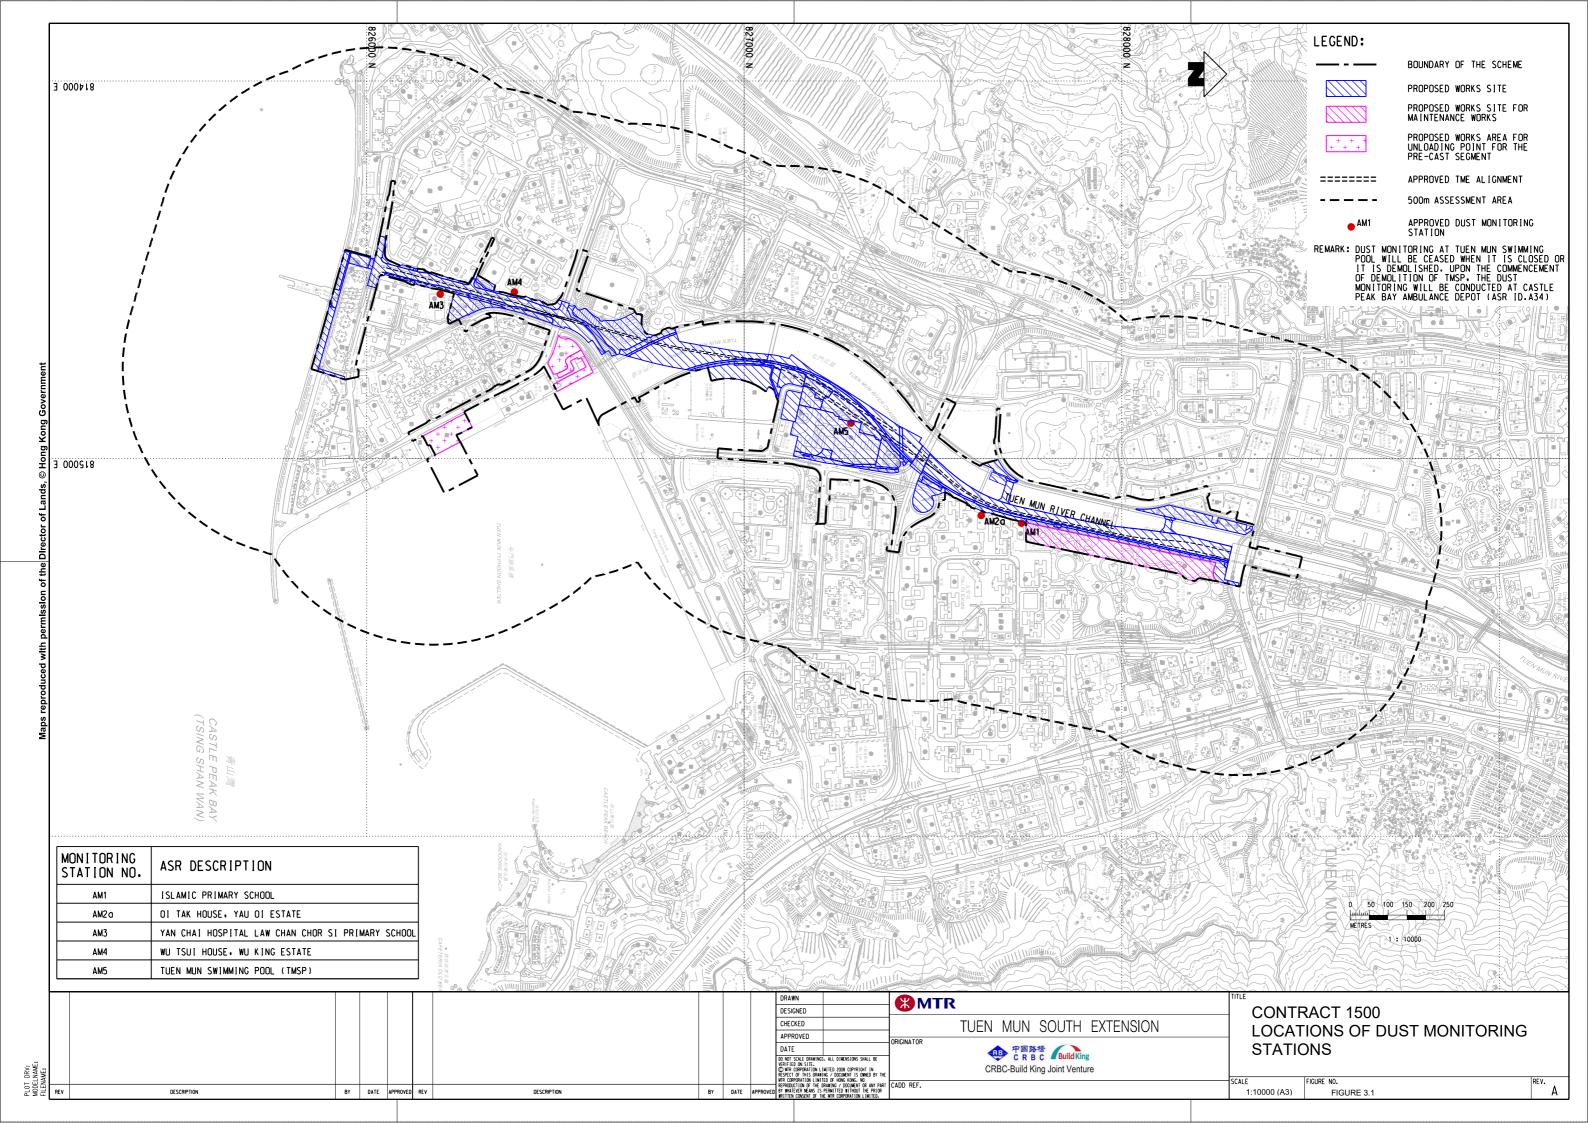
Locations of Construction Dust Monitoring Stations
